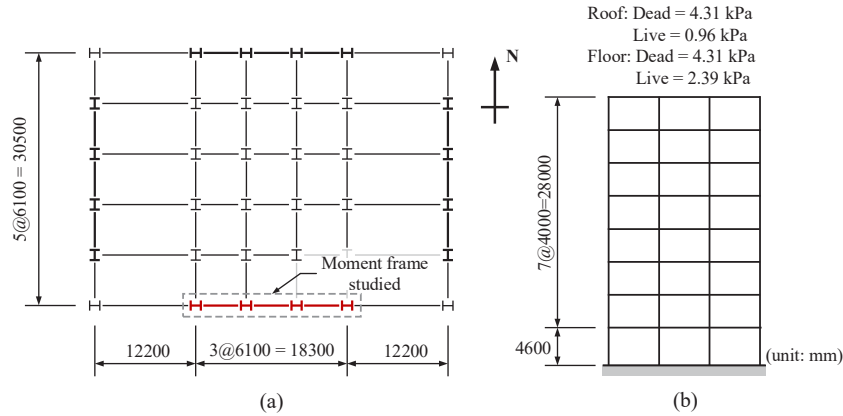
Typical 8-story archetype steel frame building: (a) plan view; and (b) elevation.
